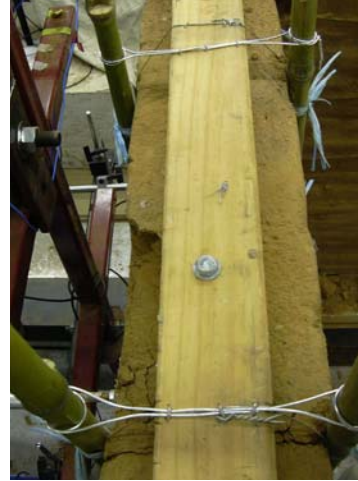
Connection of ring beam, wall and bamboo (Specimen 3E).
